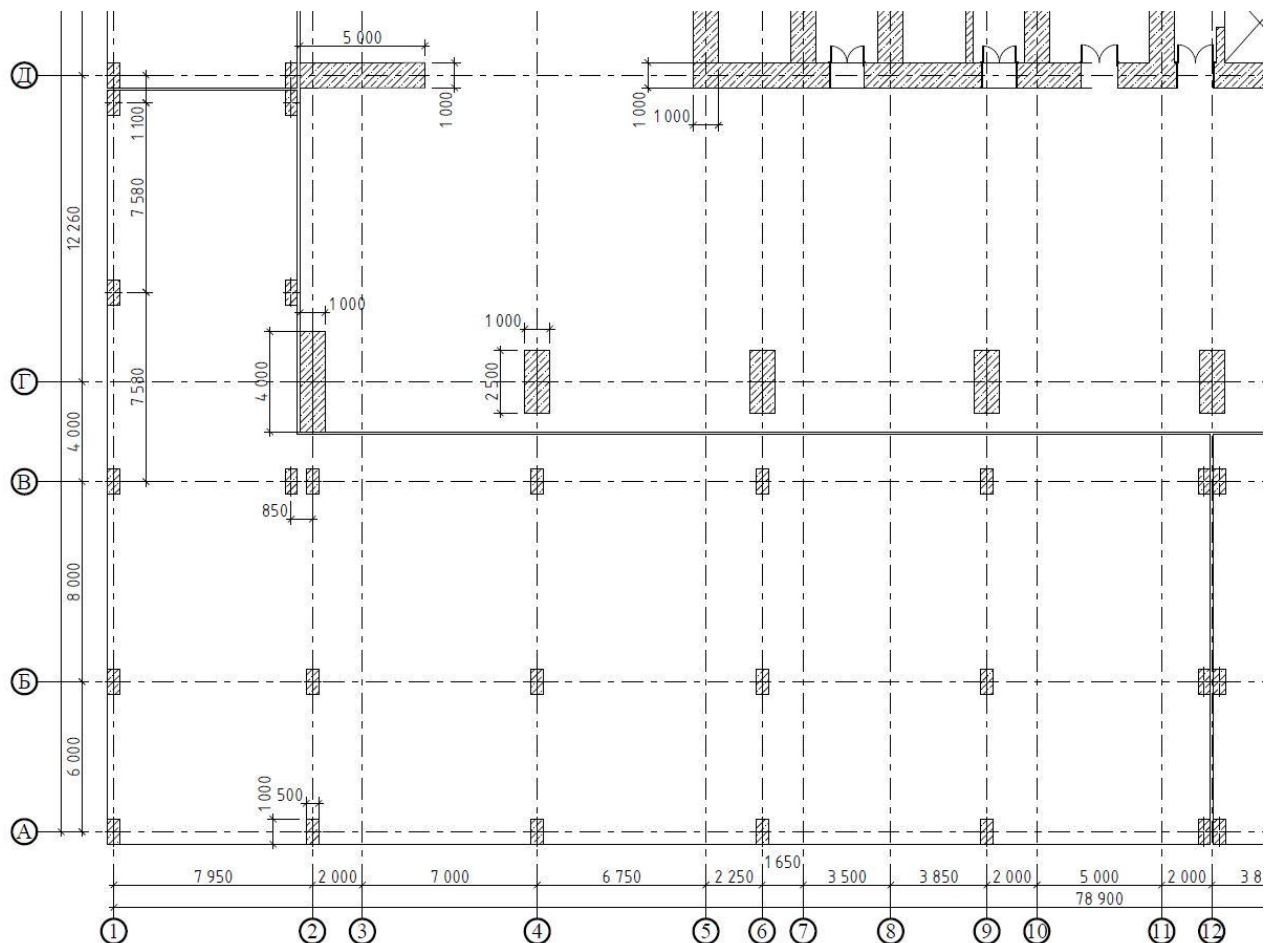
The architectural layout of the structures in the considered fragment of the building
